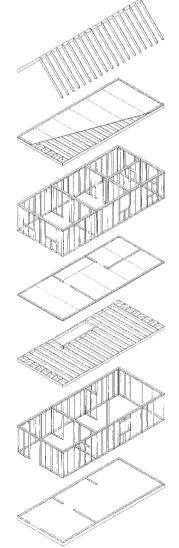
In platform frame construction the elements are stacked storey by storey.
